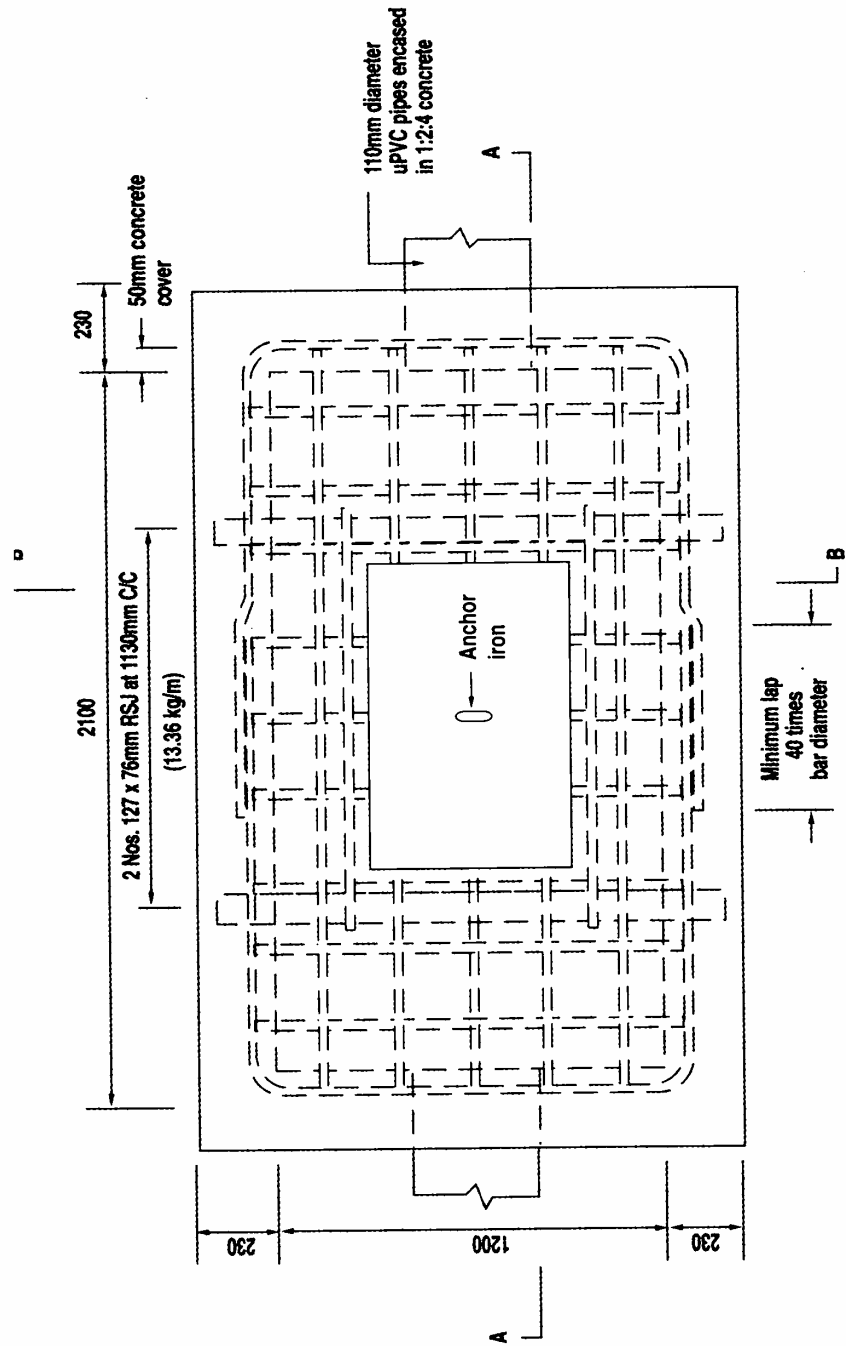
MANHOLE DRAWING - TYPE MX3
